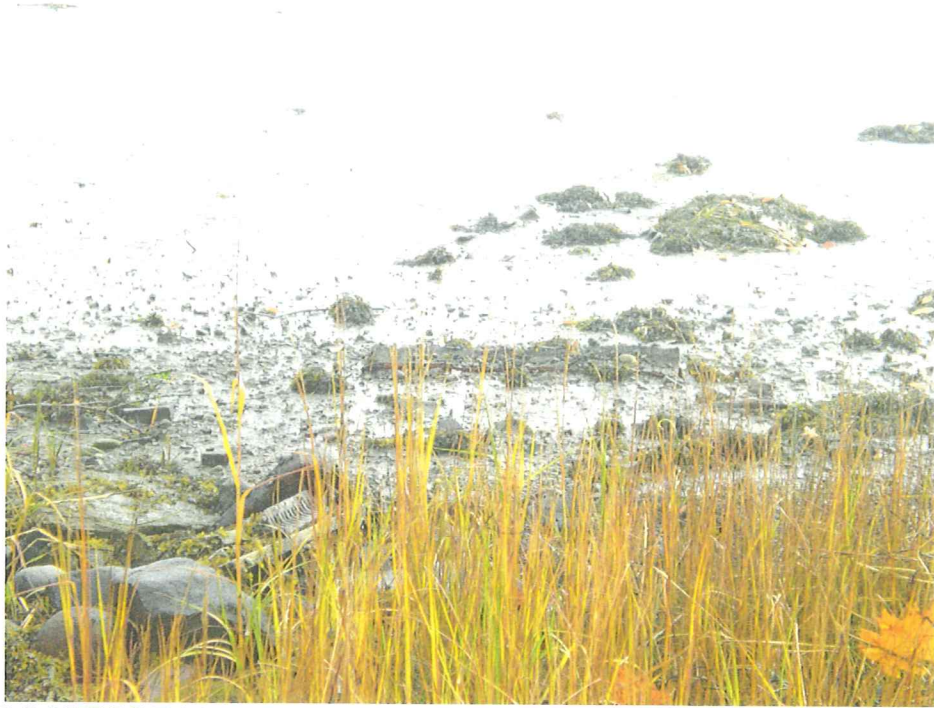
LOOKING EAST AT LOCATION OF OLD CRIB AREA AND PROPOSED DOCK LOCATION
